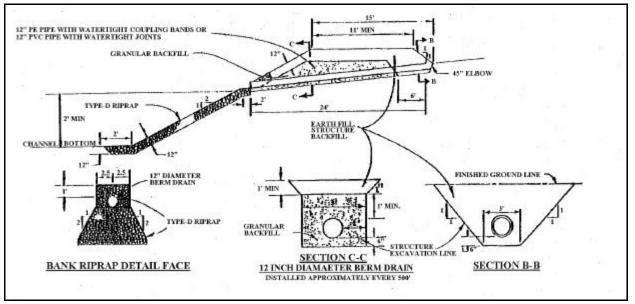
Berm drain details (Source: NRCS Files)
